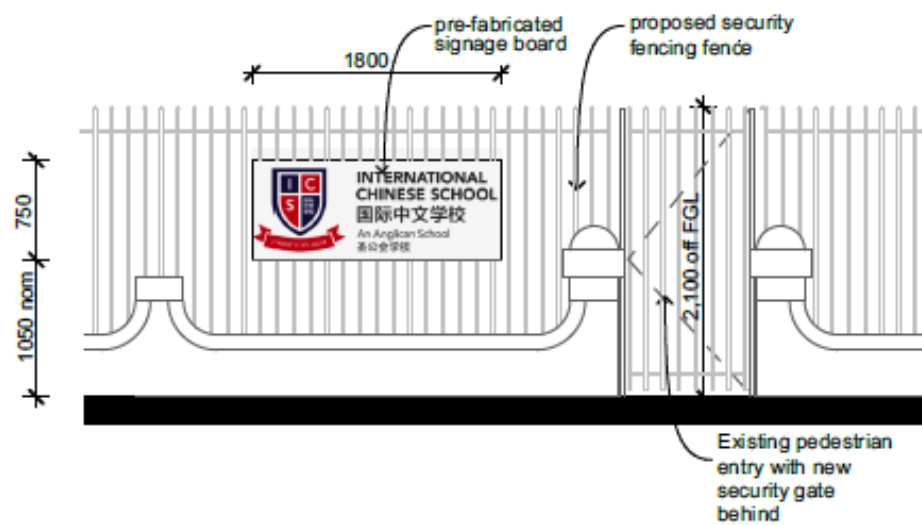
Signage located on new security fencing facing The Avenue (Source: Stanton Dahl Architects)
